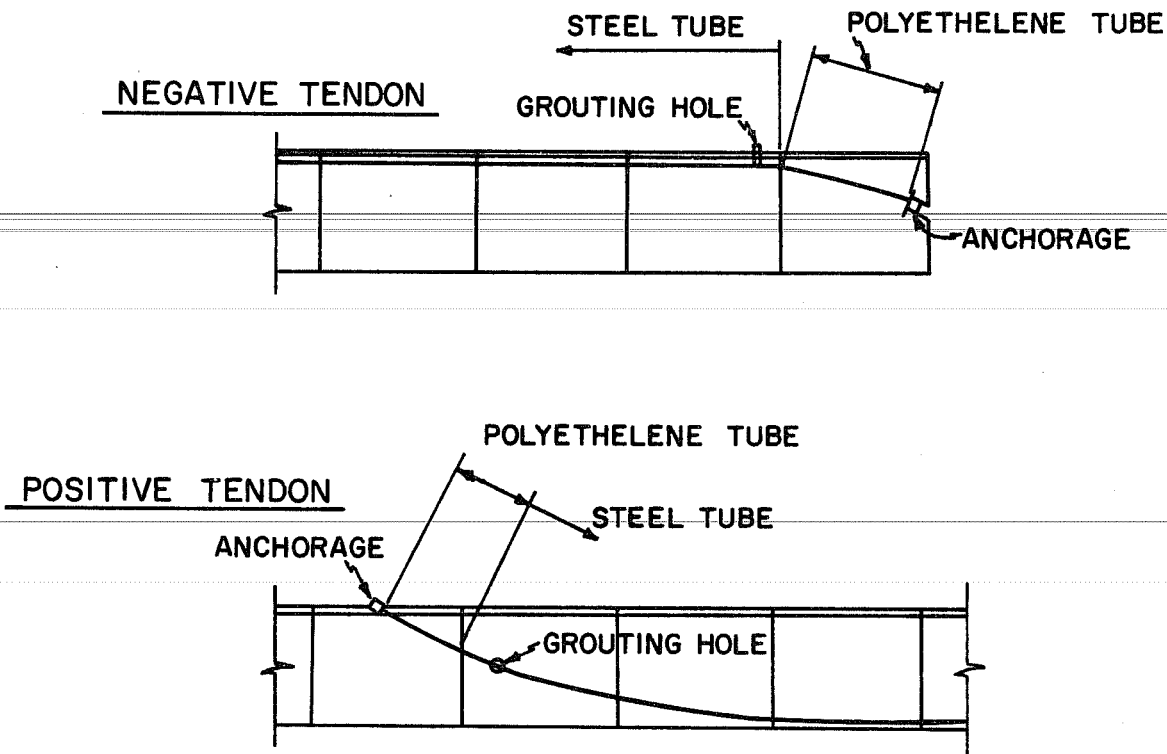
Typical arrangement of tendon duct near anchorage
